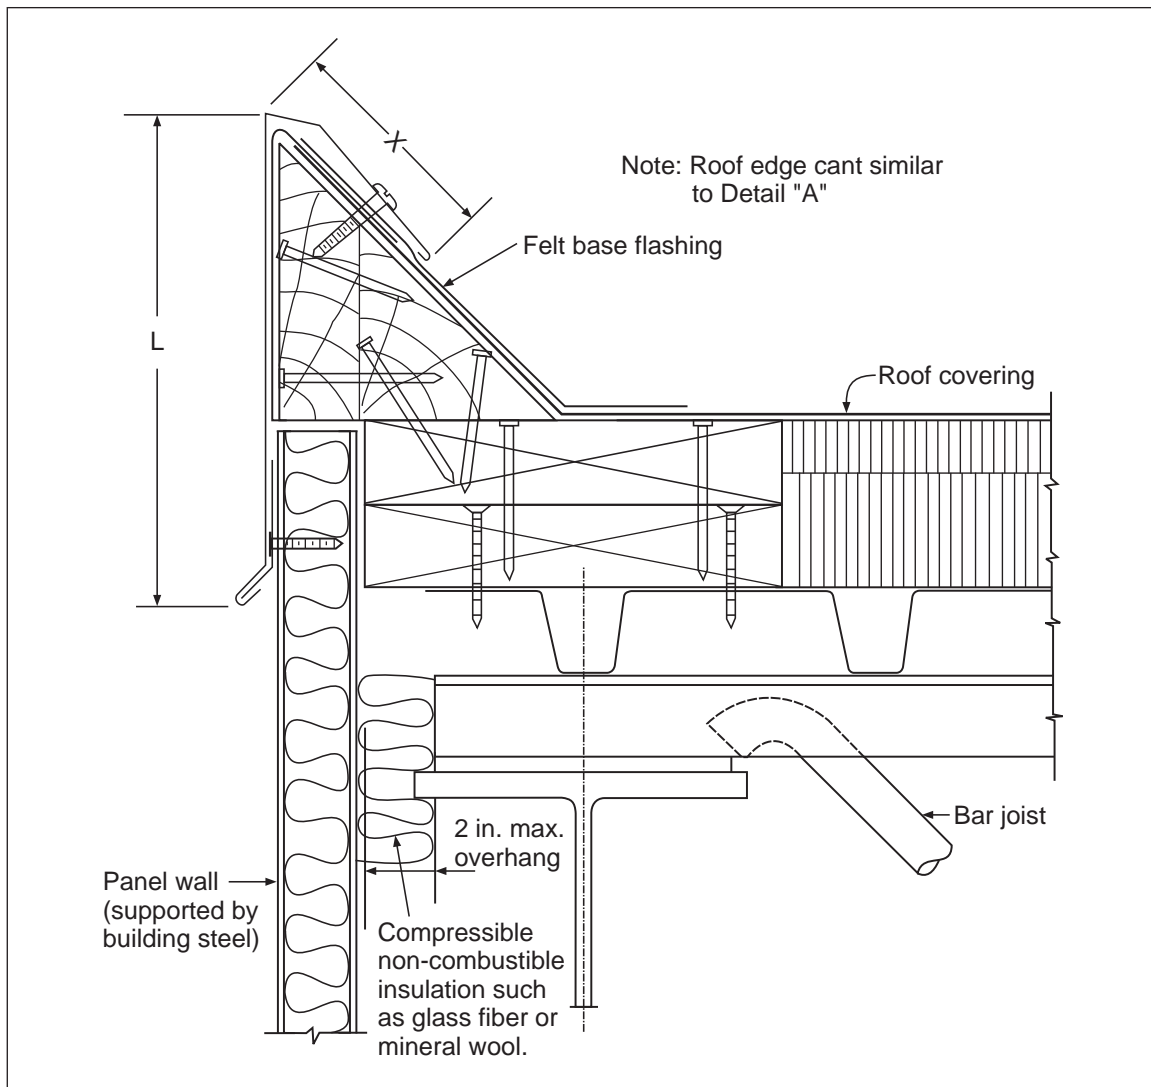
Multi-ply roof cover with panel wall with roof edge cant, nailer screwed to roof deck
